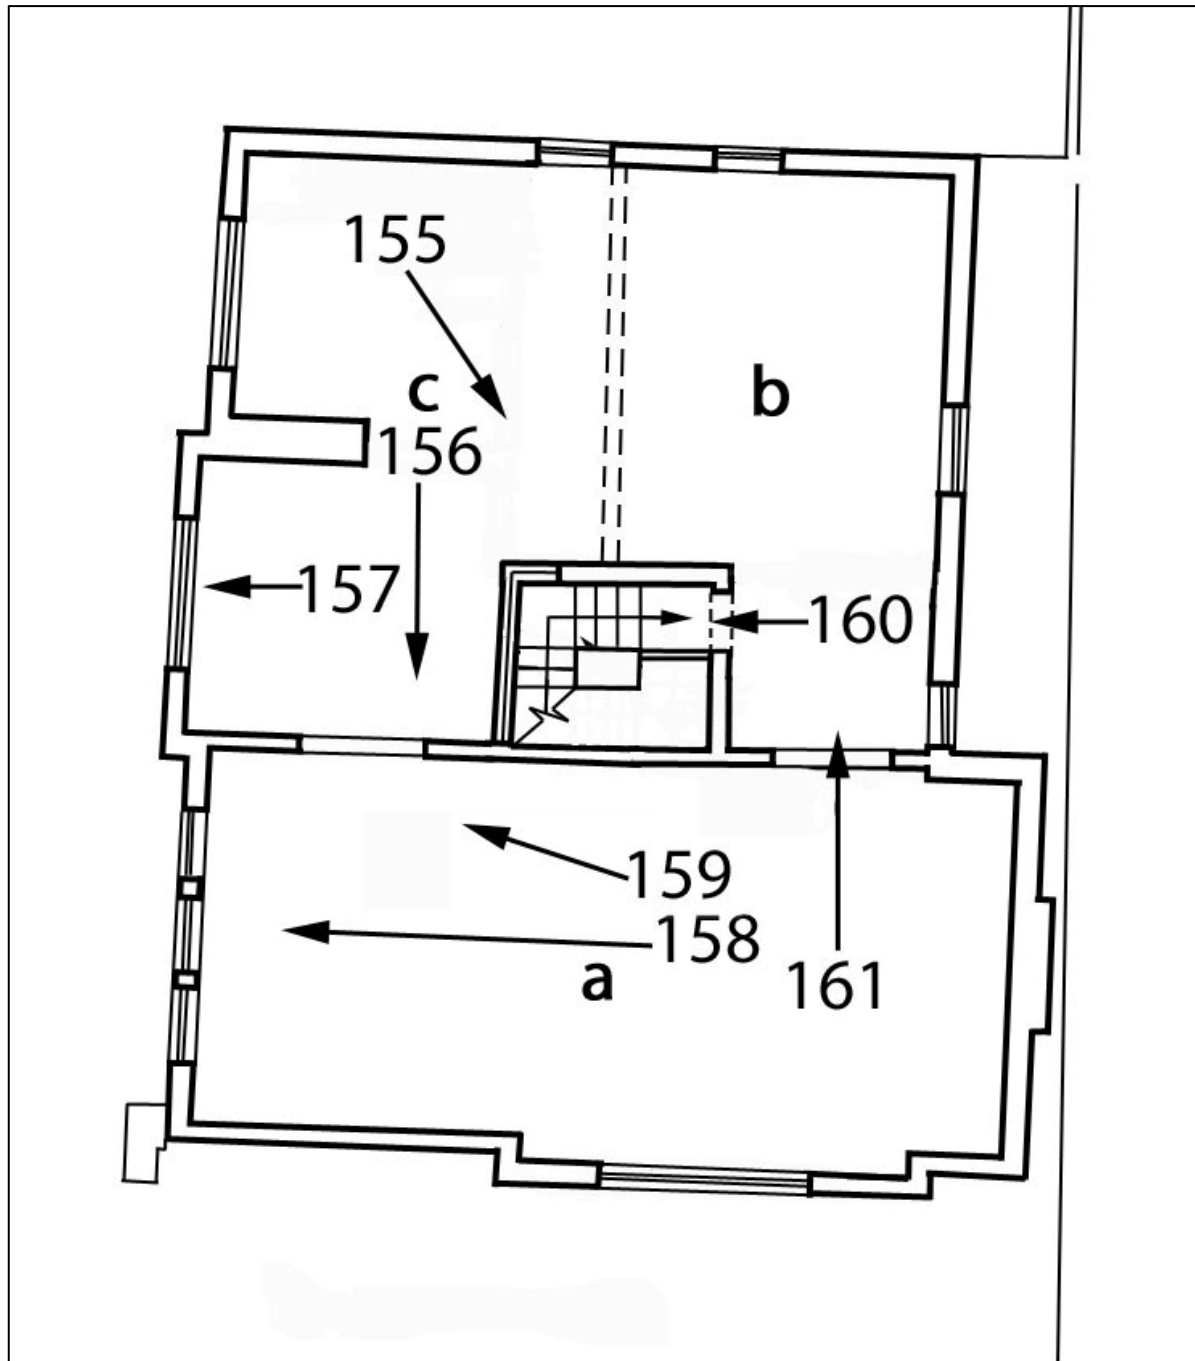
Photographic viewpoints on the second floor of building 'GF1'.
